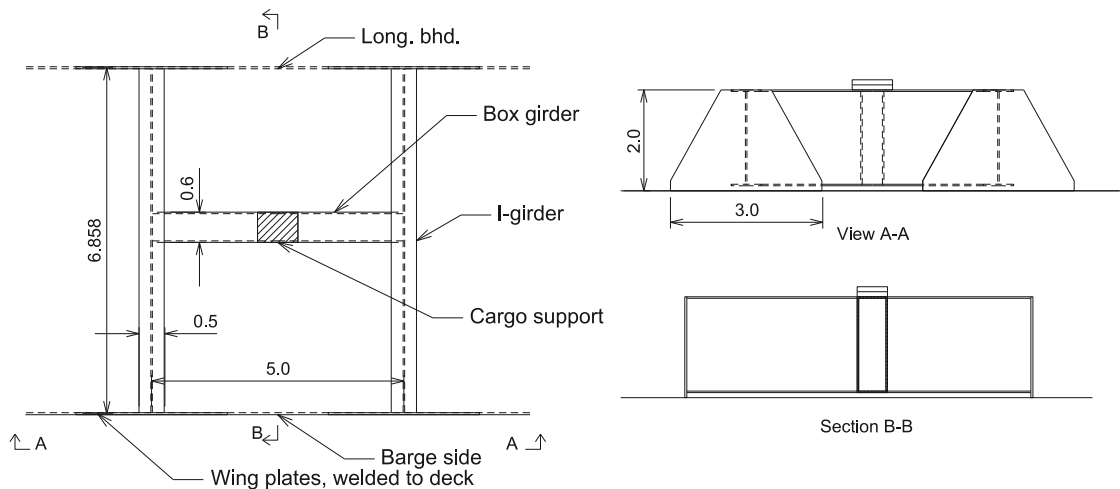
Plan view of the grillage beams, a box girder and two I-girders in the vertical support (see the red ring in Fig. 1). The grillage beams are connected to the barge deck by brackets located in-line with longitudinal bulkheads and the barge side. Typical dimensions for the barge transport of a heavy object of 3500 tonnes are given (unit, meters). Typical grillage beams would be made by welded steel plates with a yield stress of 355 MPa, a flange thickness of 40–50 mm and a web thickness of 30–40 mm, with local reinforcements as required (the connection toward the deck varies depending on the ship's local strength).
